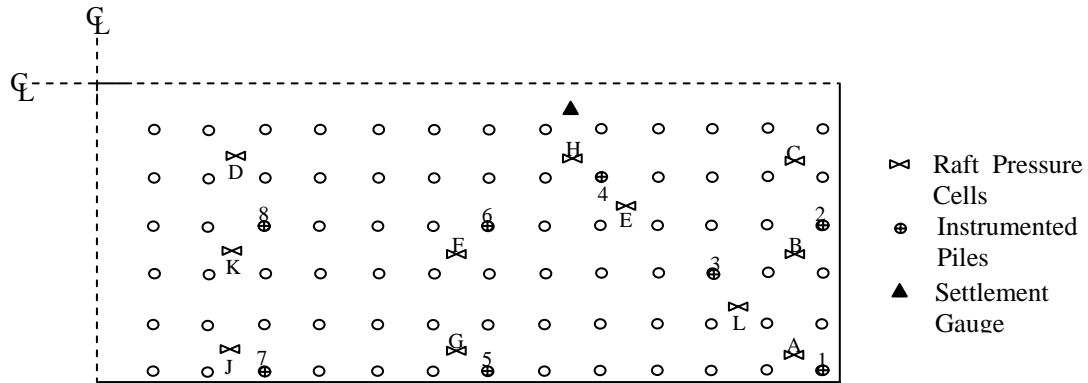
Instrumentation Quadrant for Stonebridge Park Apartment Building (Cooke *et al.*, 1981).
